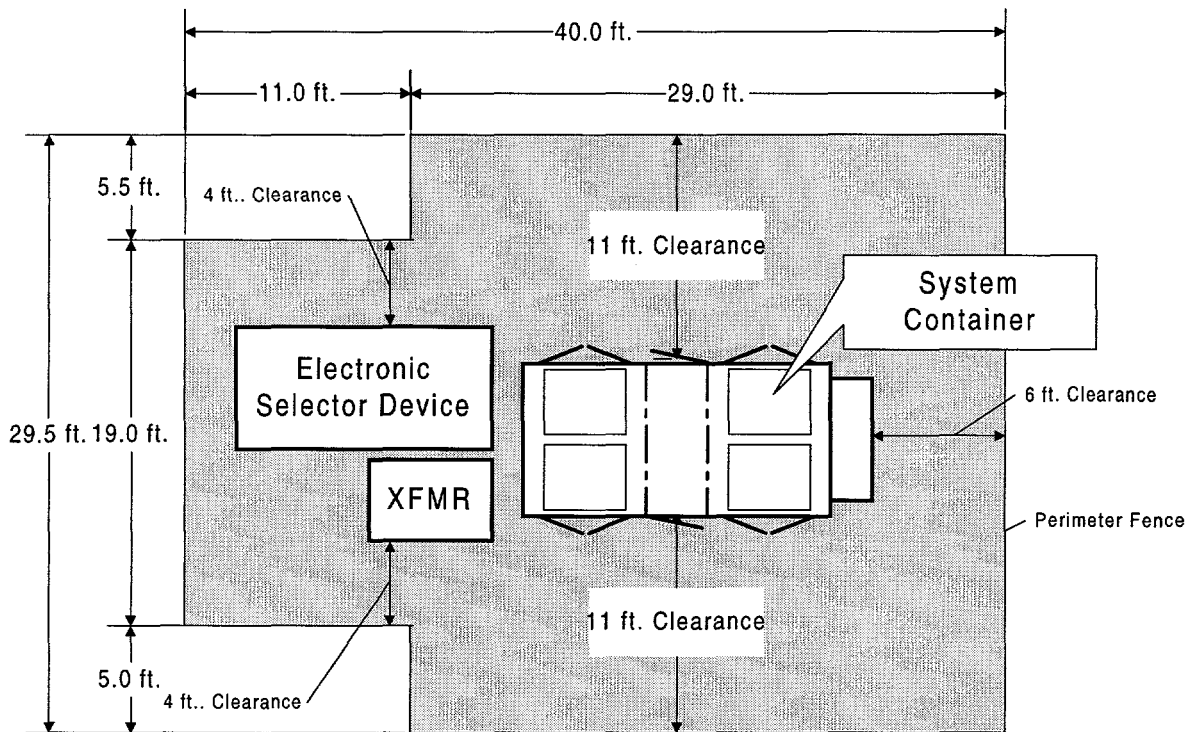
Typical AC Battery PQ2000 Site Layout Plan
